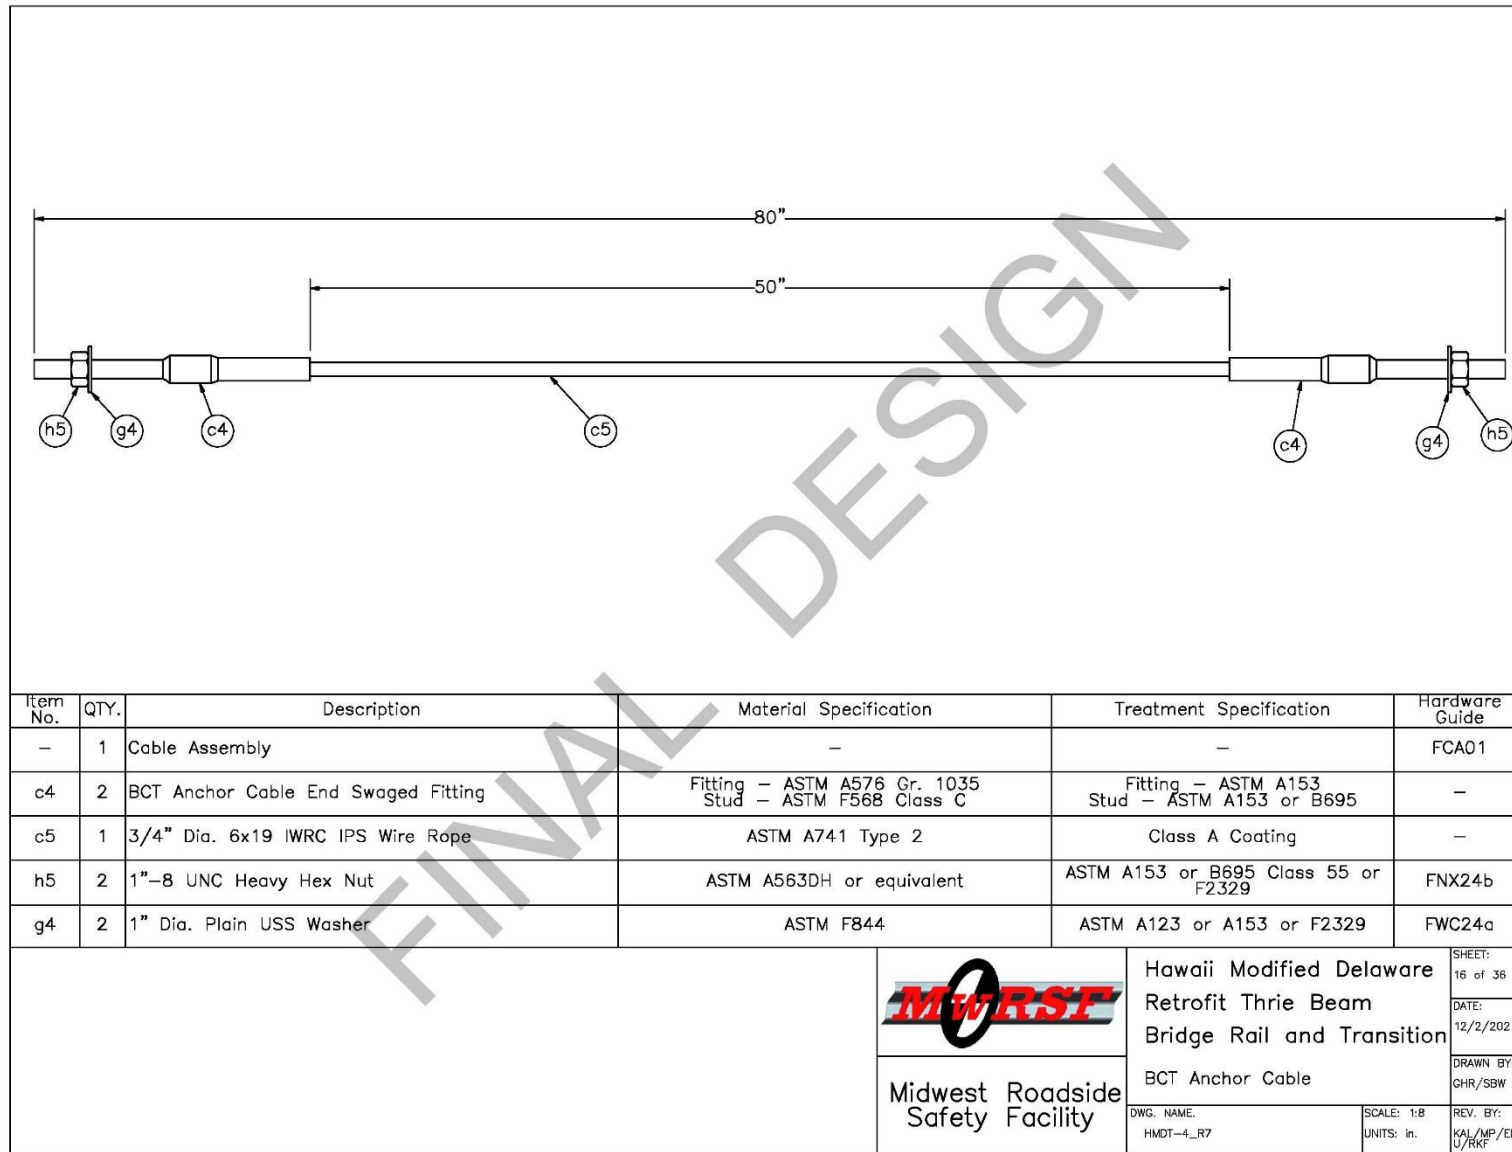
BCT Anchor Cable, Test No. HMDT-4
